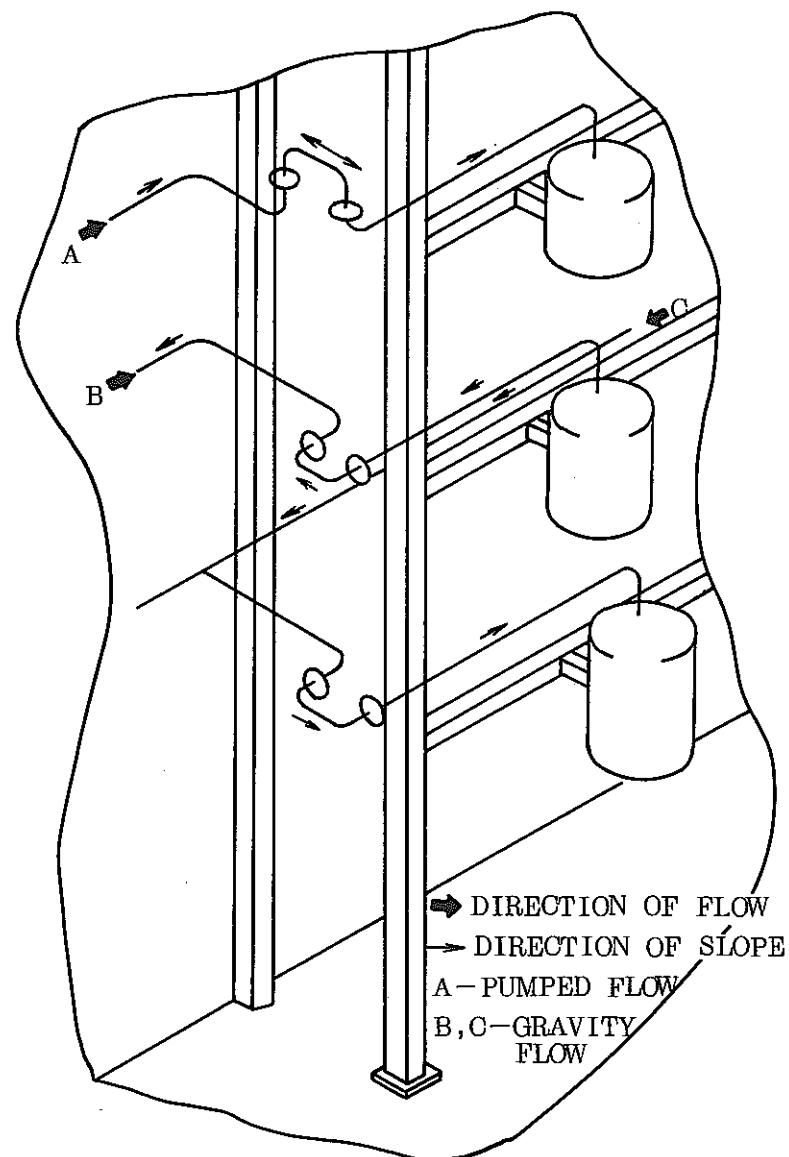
Rack to Pipe Header Jumper Configurations
